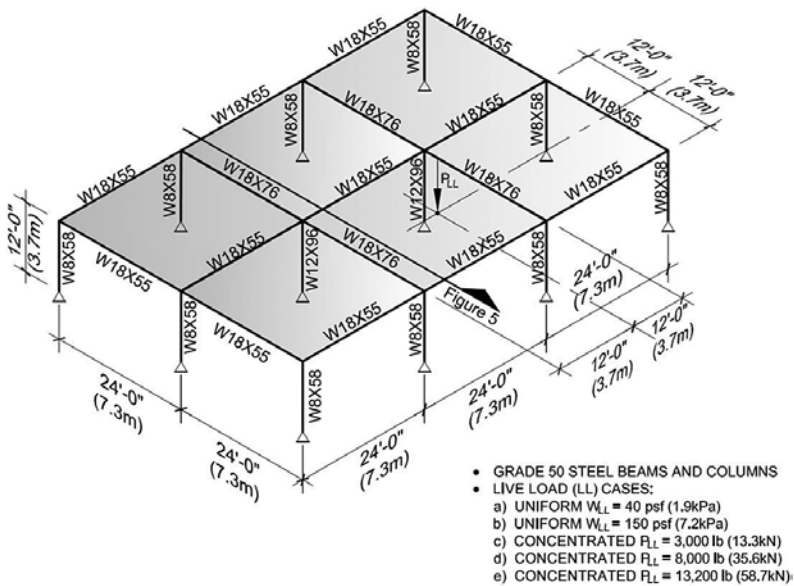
Three-dimensional view of analytical model of topping slab supported on structural slab and steel framing
